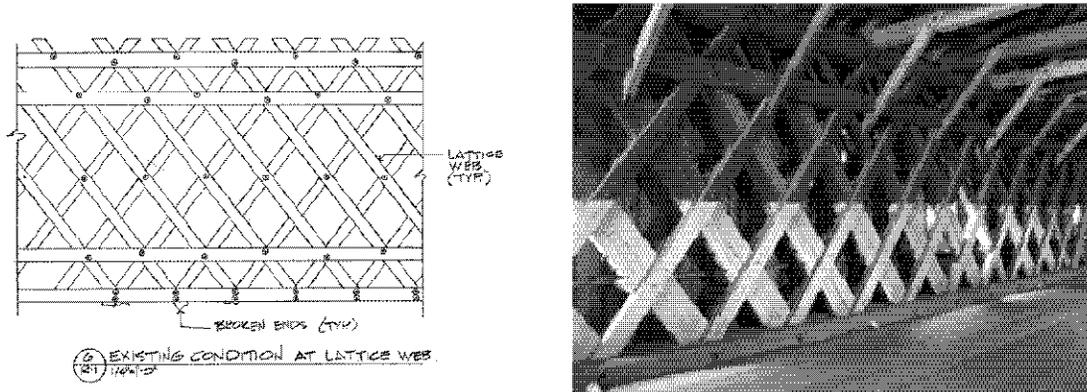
General arrangement of the Cornish-Windsor Town lattice truss structure⁴⁸
